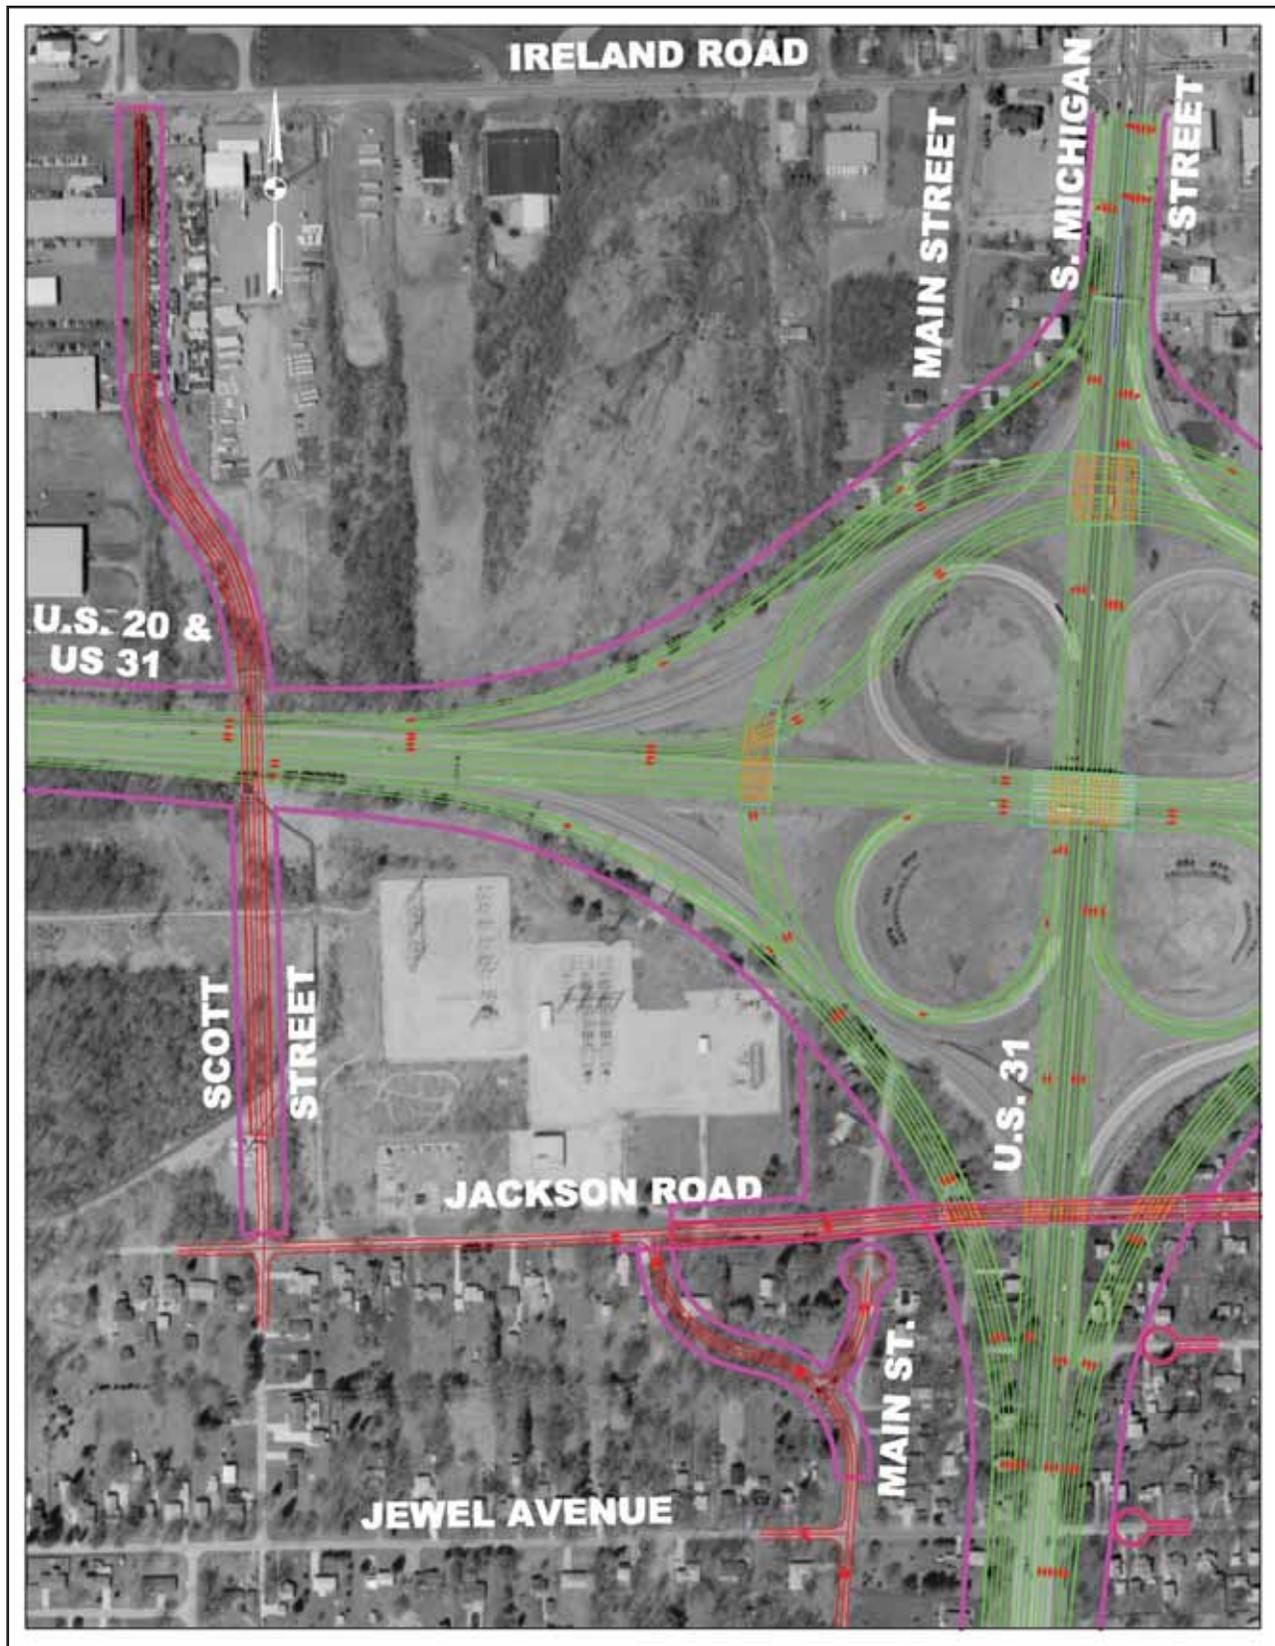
Scott Street Extension Local Roadway Improvement Project
